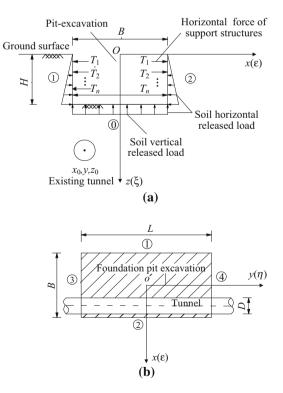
Sketch of analytical model. a Front view. b Plan view
